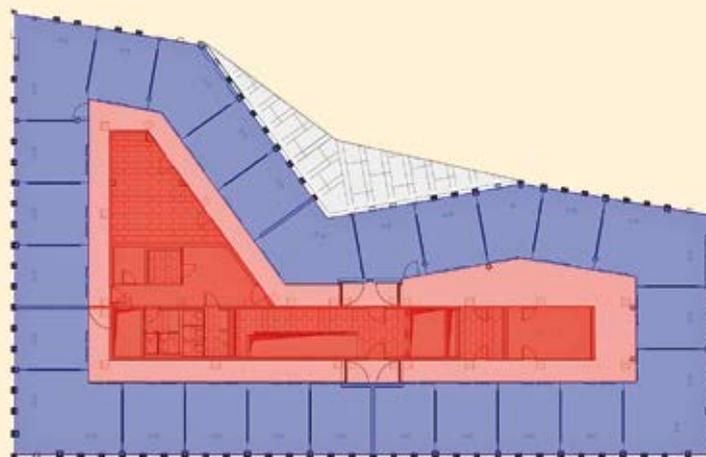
Floor plan of the third storey: The staircase, corridors, meeting rooms, copy rooms, IT rooms, kitchenettes and toilets are located in the inner zone (red).
